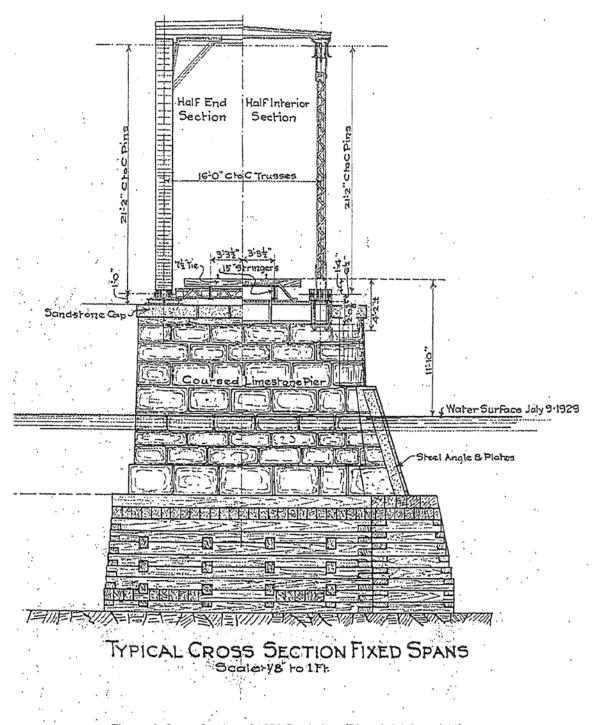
Cross Section of 1873 fixed piers (Piers 2,4,6,8, and 10)
